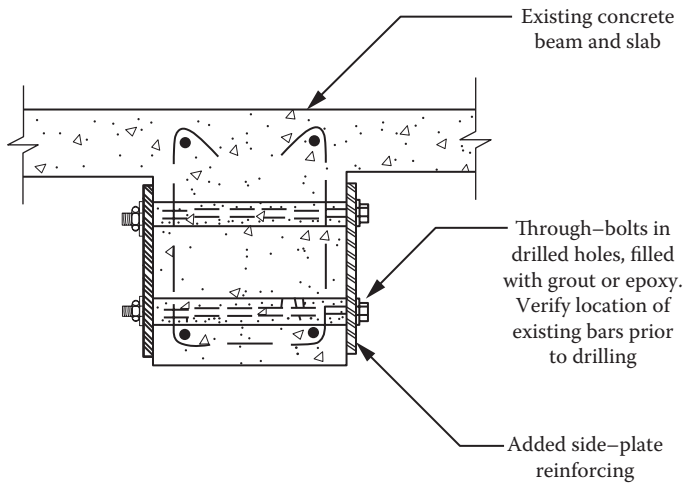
Adding steel plates to improve the shear resistance of an existing concrete beam.
